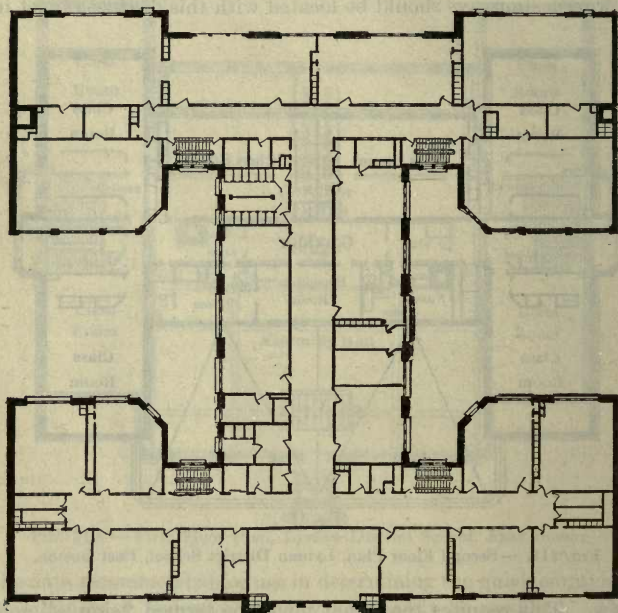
Second Floor Plan, Stuyvesant High School, N. Y.
